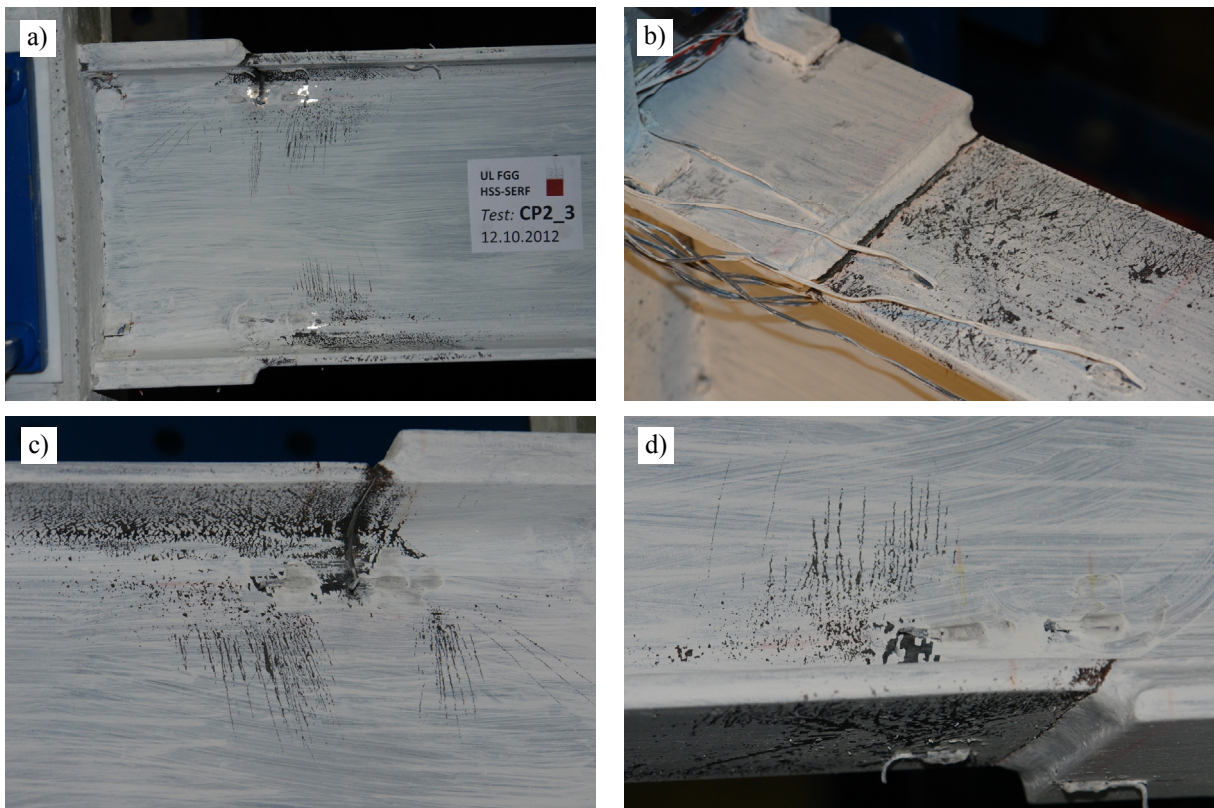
Specimen CP2.3 after the test: a) local strained area of the beam just after the stiffened section, b) fracture of top beam flange, c) crack on top beam flange, side view, d) damaged bottom beam flange
